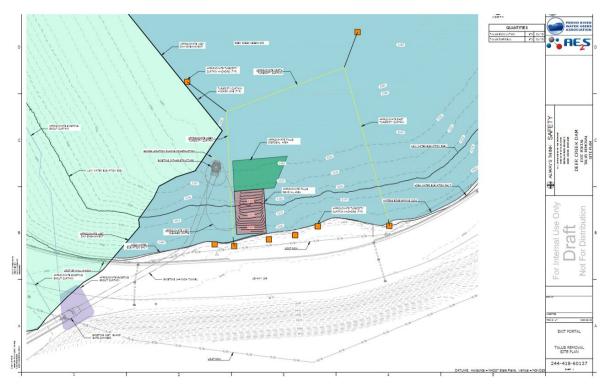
Talus Removal Area and Disposal Area to Support Microtunnel Exit Portal Construction
